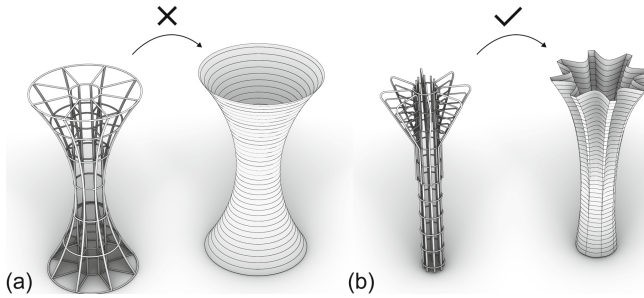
(a) A combination of reinforcement and formwork geometry that cannot be combined. (b) Reinforcement can be placed inside the formwork from top.
